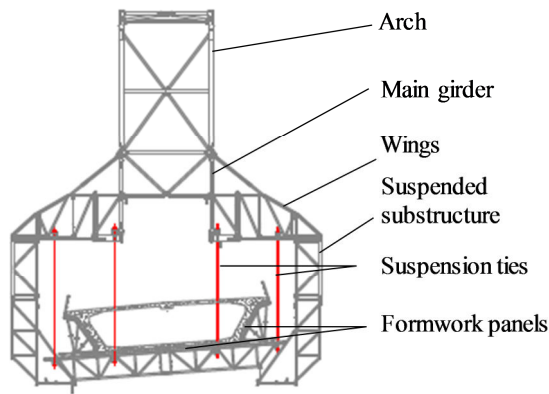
Cross-section of the MSS main girder including suspended substructure for support of the formwork [28].
